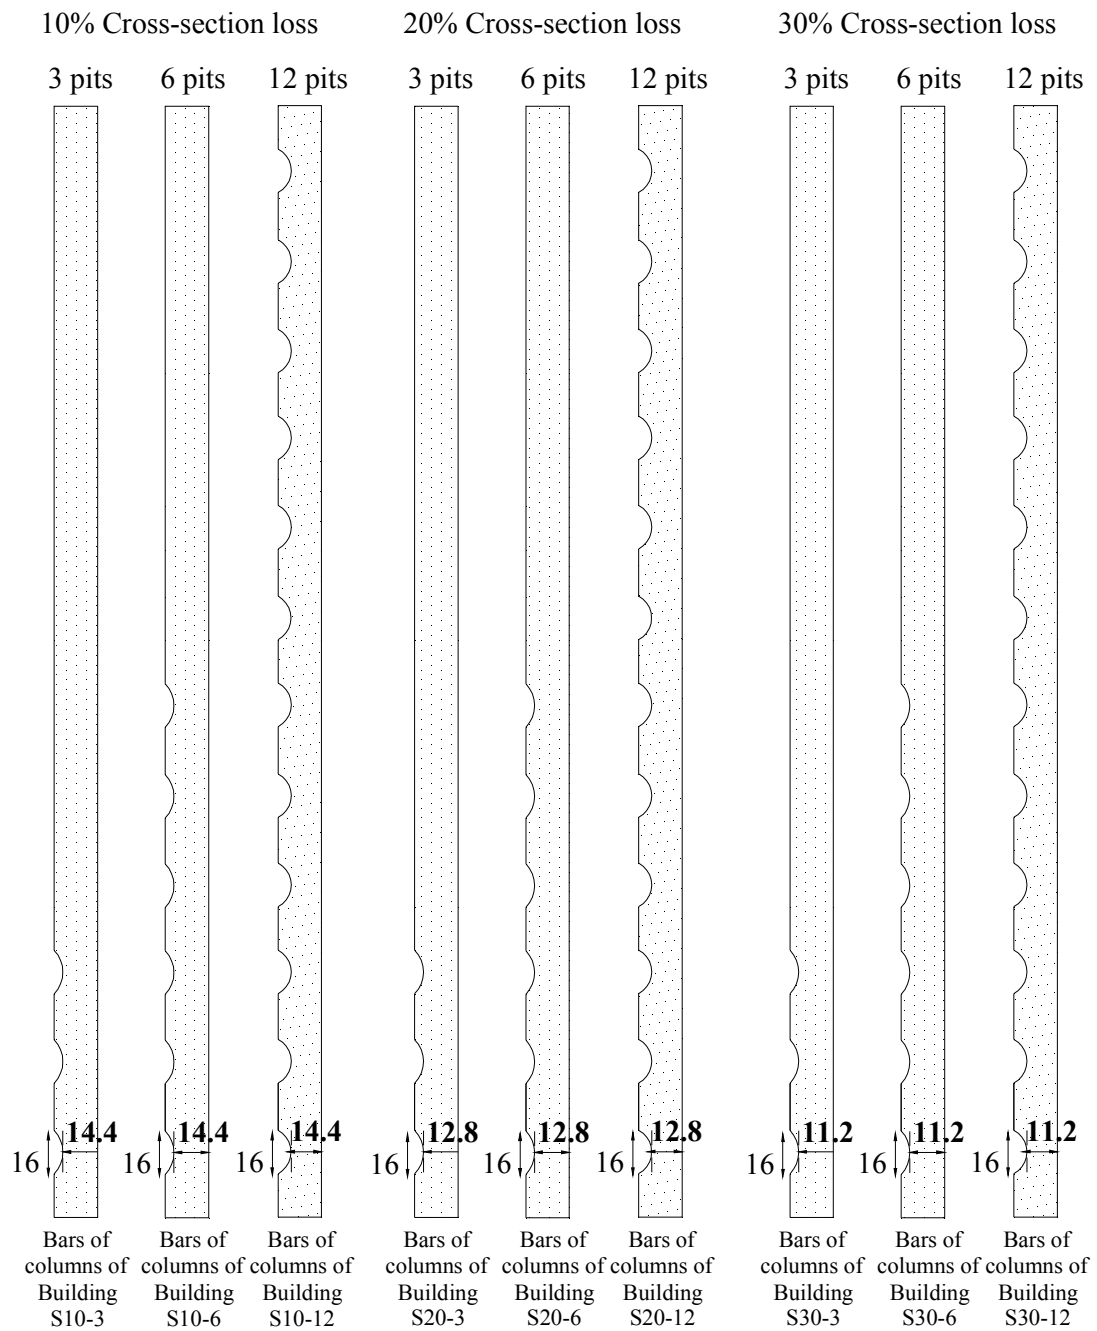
The assumed dimensions of the pits on a typical reinforcing bar of column (Dimension units in mm).
